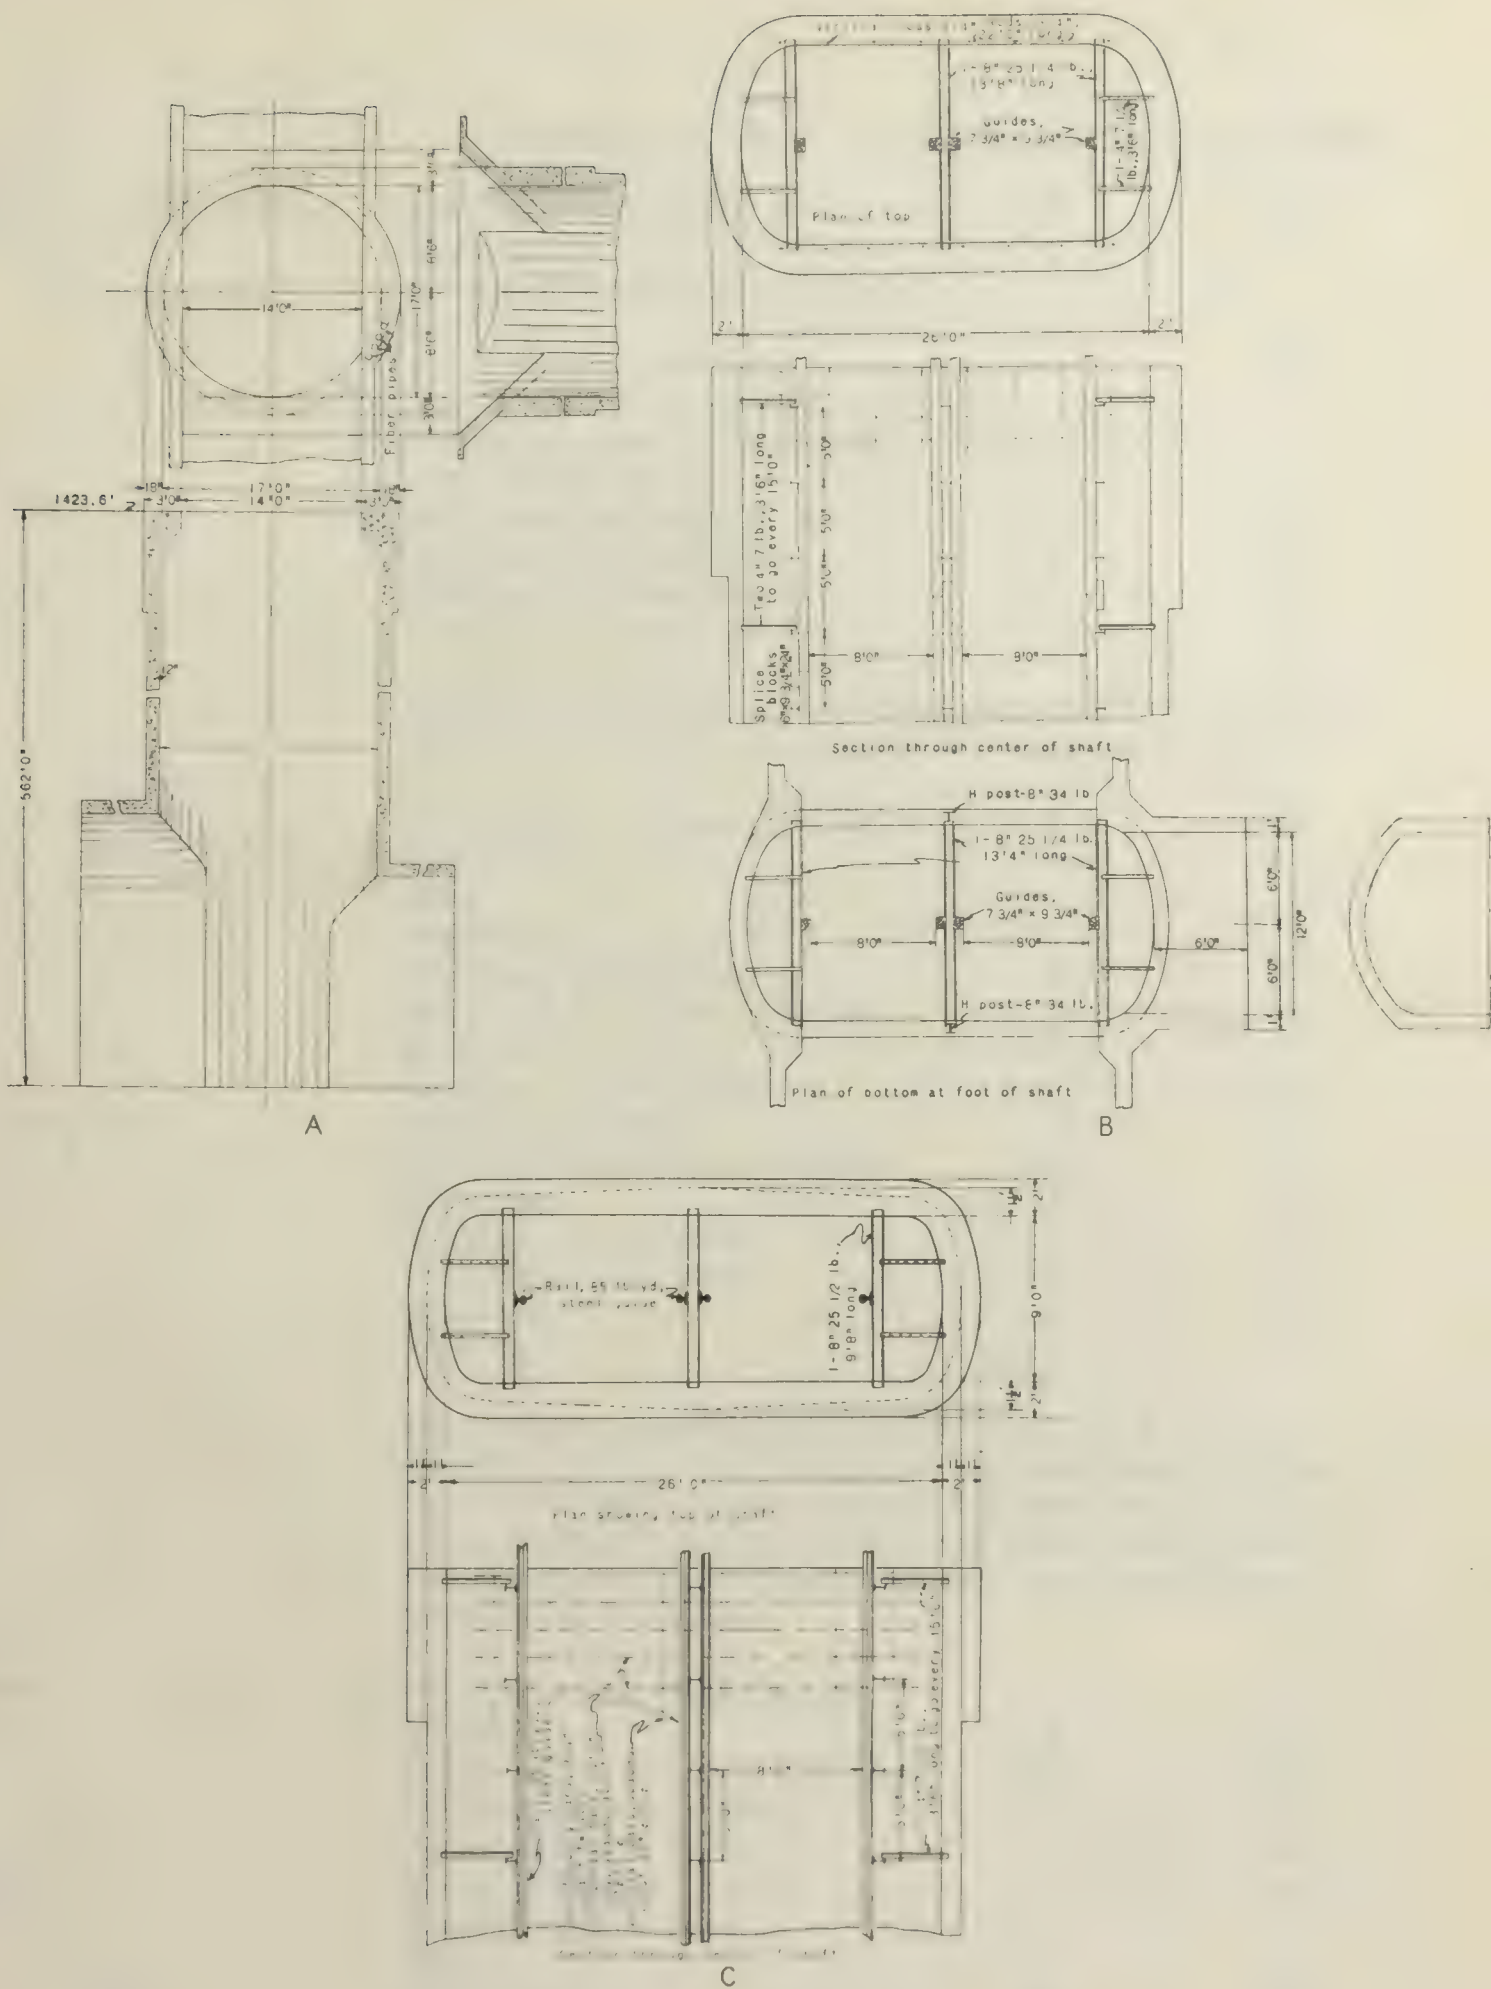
Details of shafts: A, Air shaft; B, manway shaft, C, ship shaft
